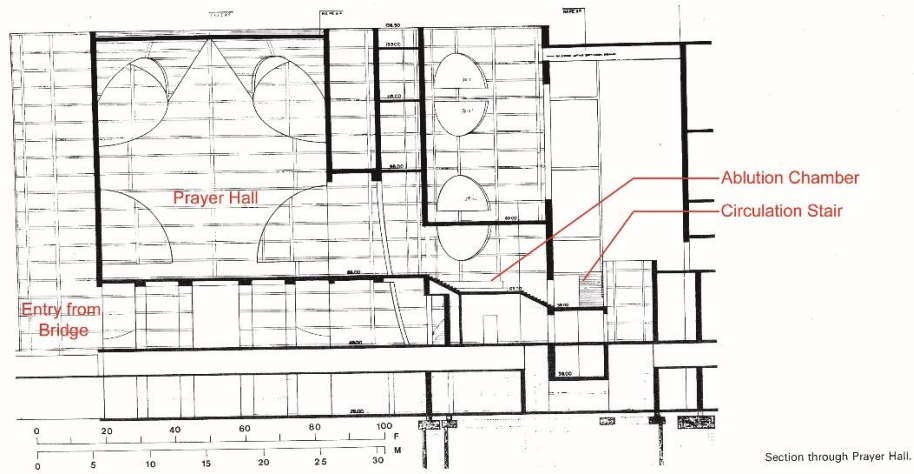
Louis Kahn, section through Prayer Hall, Bangladesh Parliament Building, Dhaka, Bangladesh, 1962.
